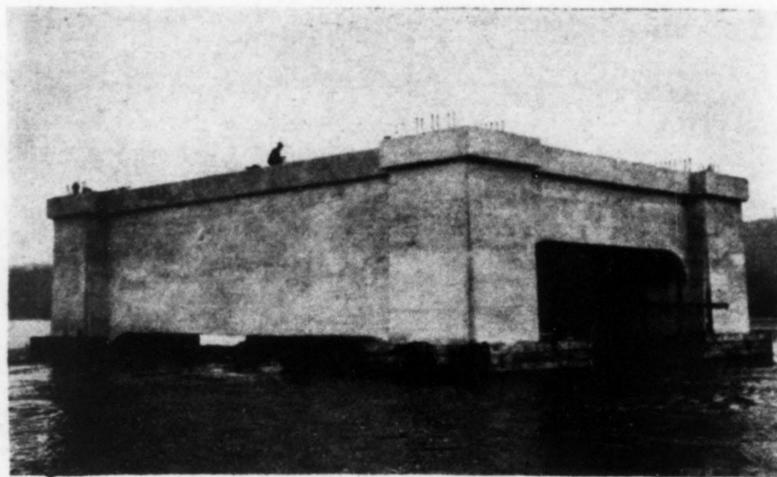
MAIN CHANNEL PIER COMPLETED, LONGVIEW BRIDGE
